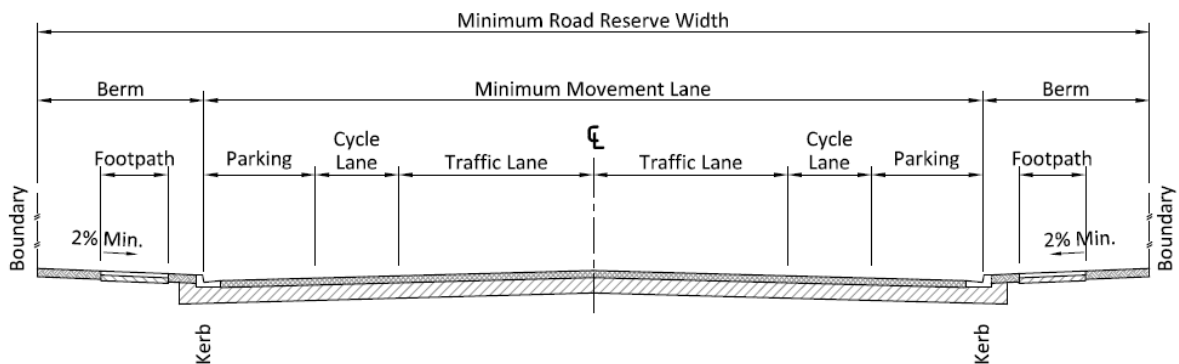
Typical Urban Road Cross Section: Drawing No. C1
